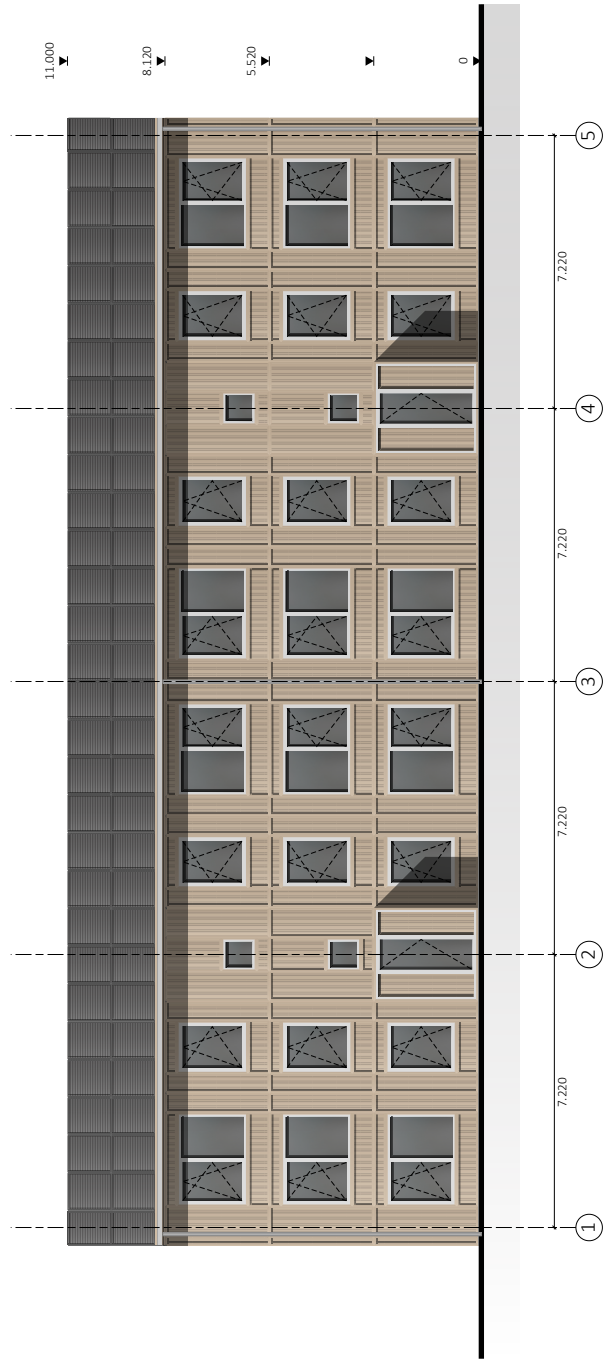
Elevation | 1:200 | South (own illustration)
